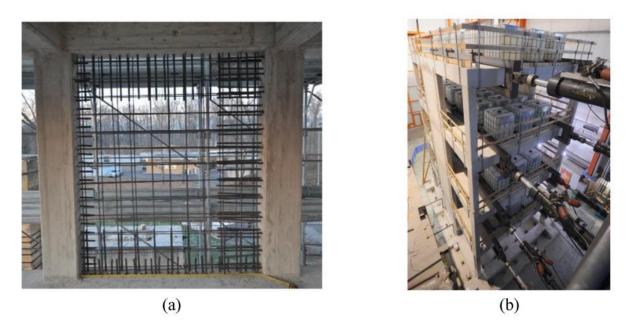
(a) RC infill wall dowels and web reinforcement; (b) Prototype testing
